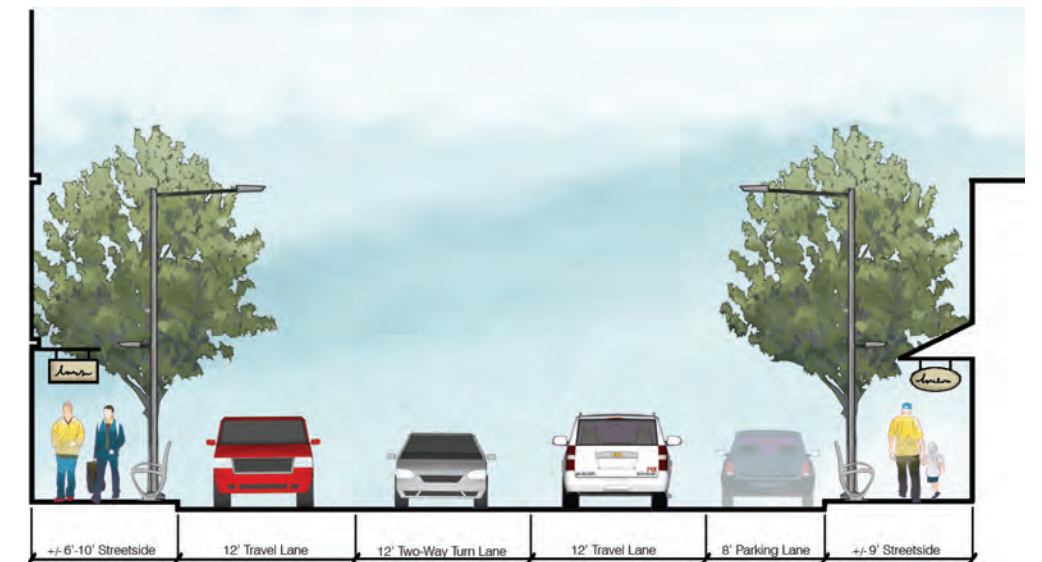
Flores Street Proposed Cross-Section, Nueva to Dolorosa
